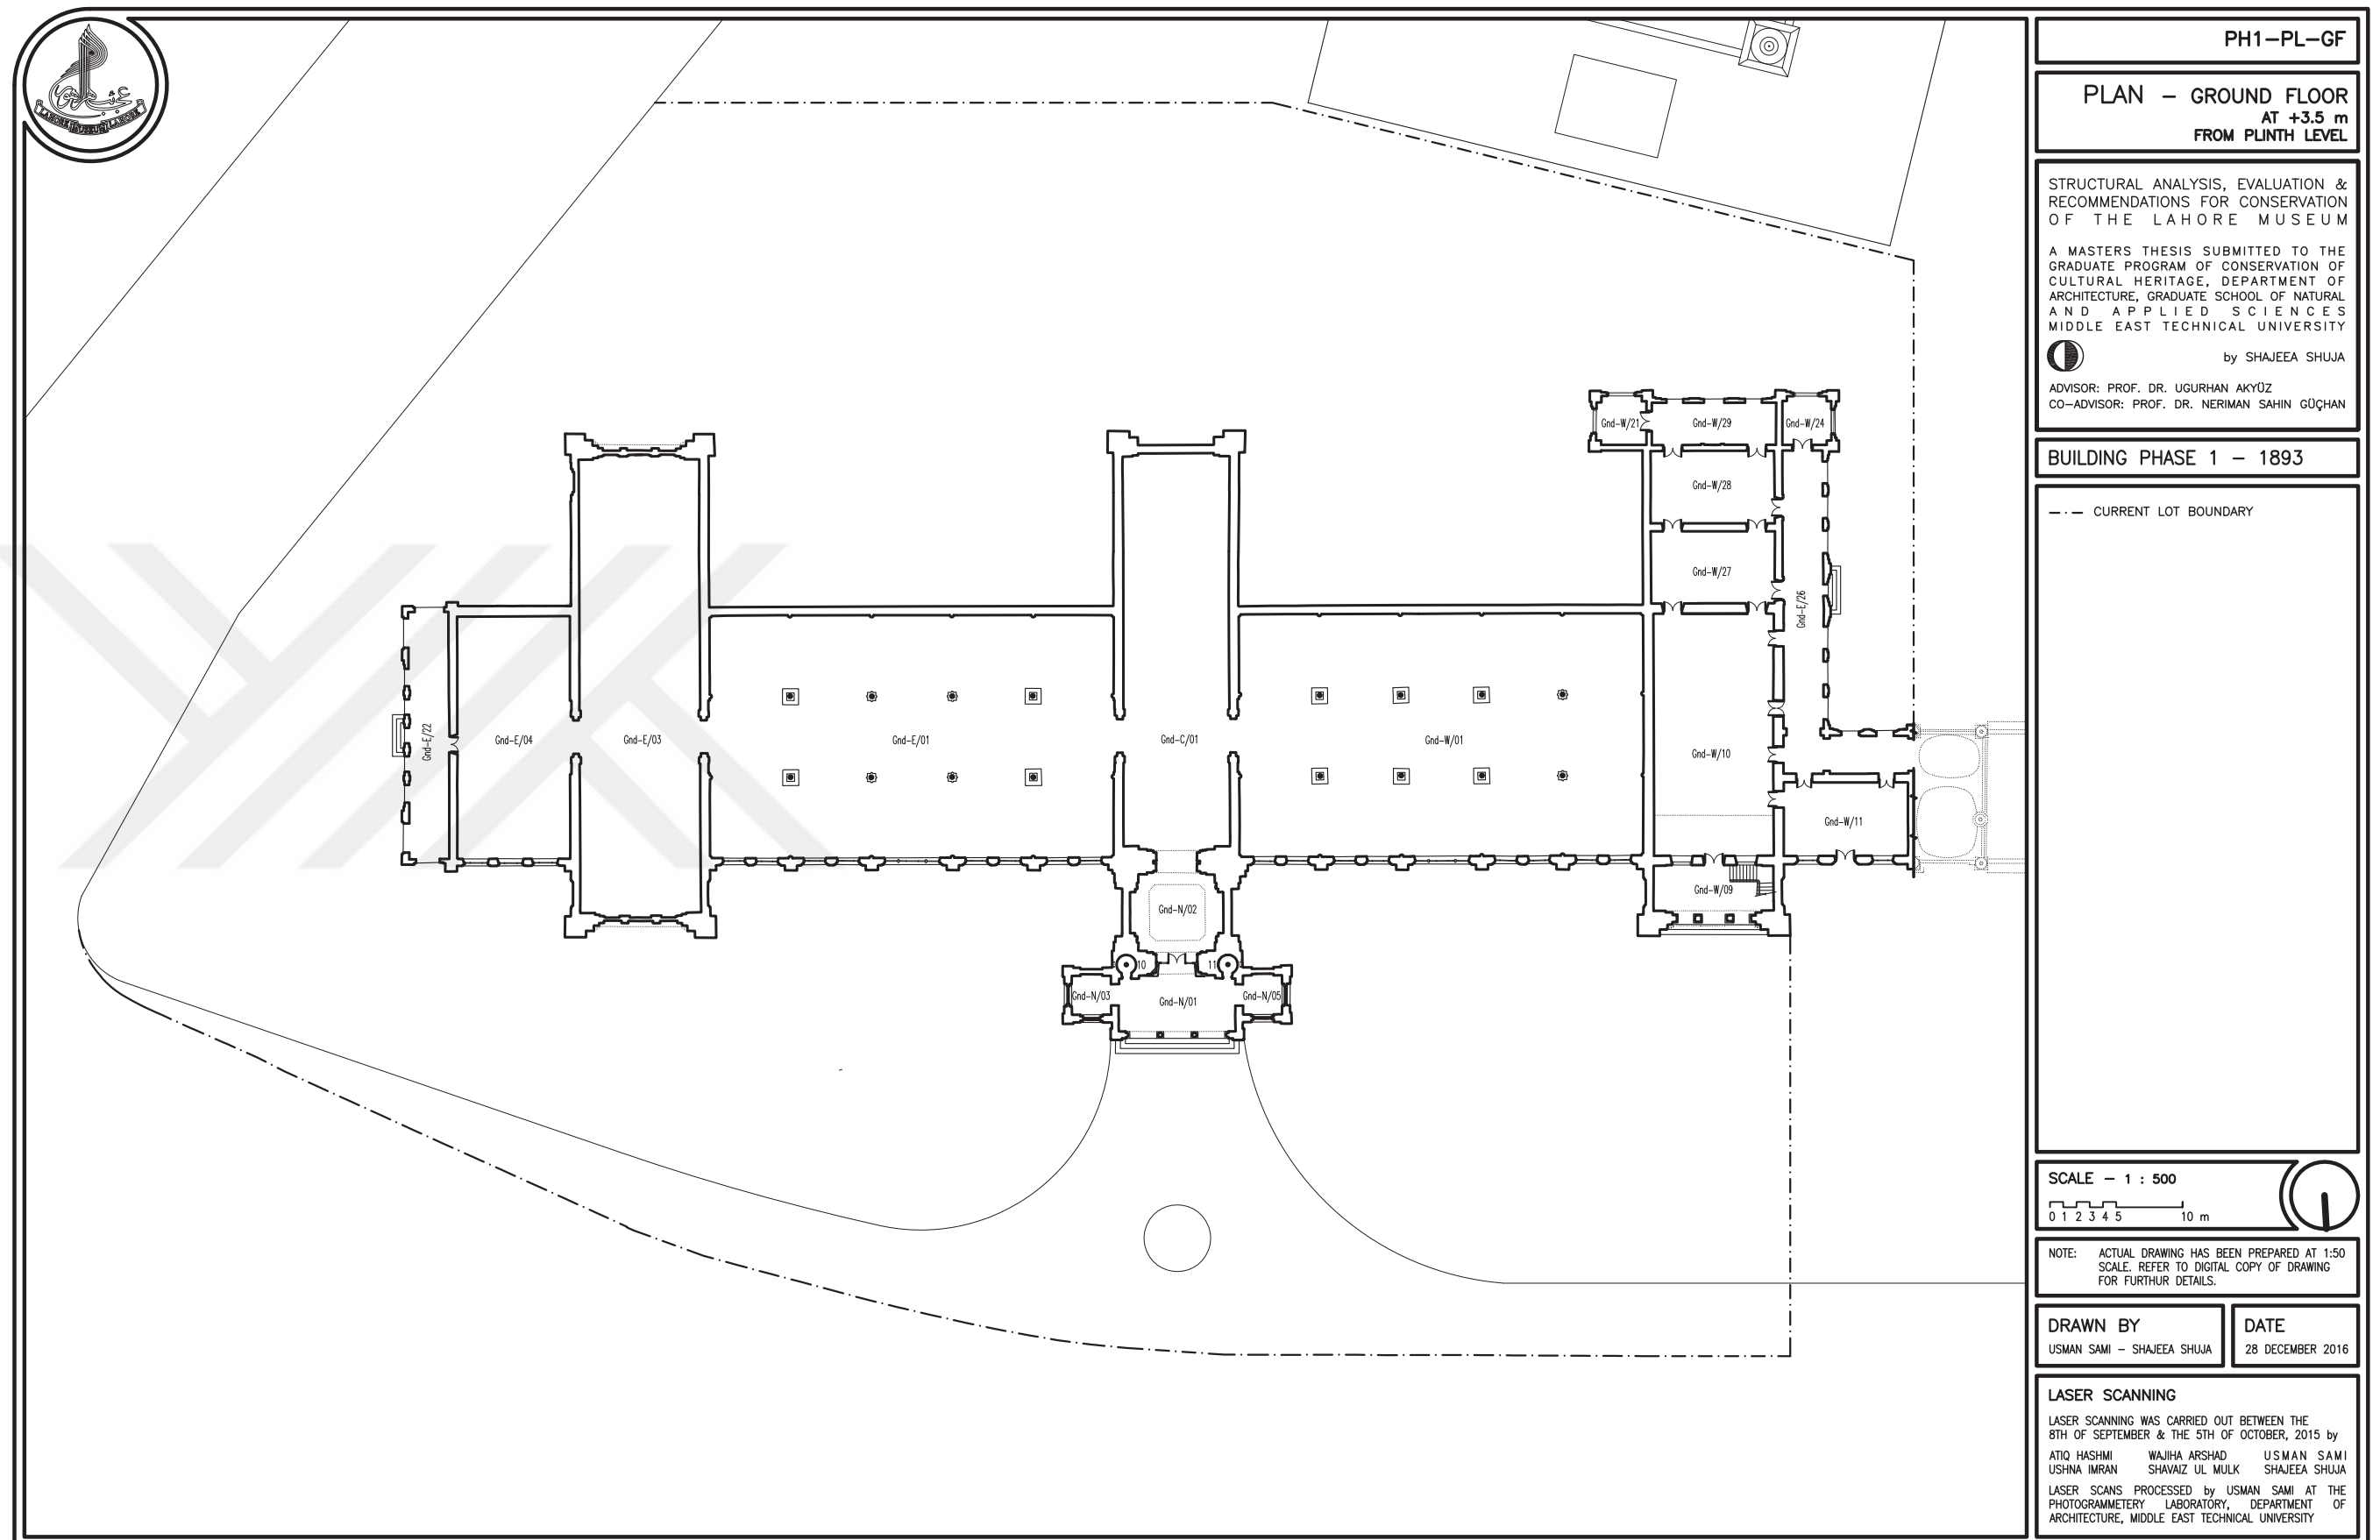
PH1-PL-GF – Building Phase 1 – 1893 Plan – Ground Floor (2016)
